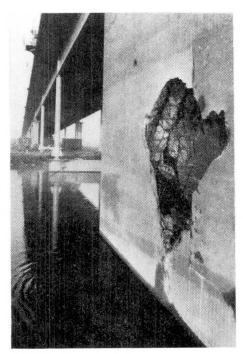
Damage on a bascule-pier at the Jordfallet-bridge
